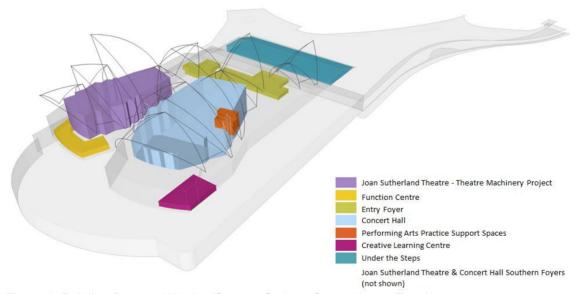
Building Renewal Works (Source: Sydney Opera House Trust)
